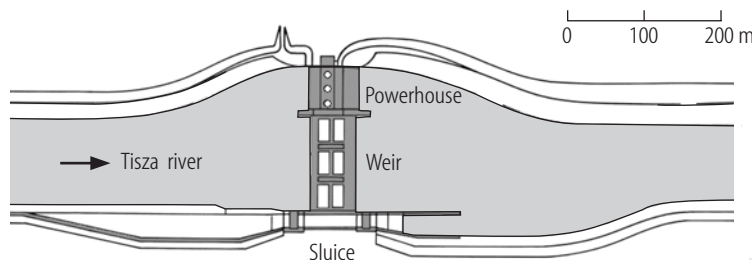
Example layout of the power house, weir and sluice at the Tisza River in Hungary.
